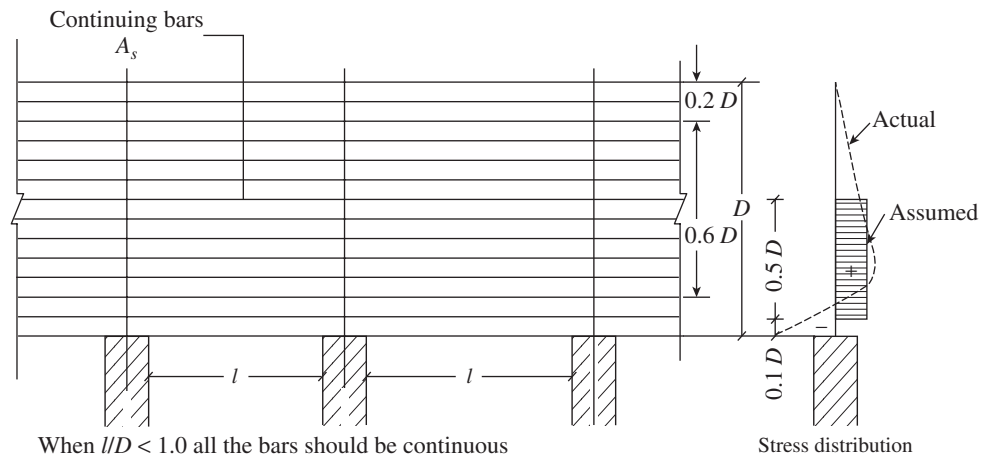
Detailing of negative reinforcement in continuous deep beams ($l/D \leq 1.0$)
